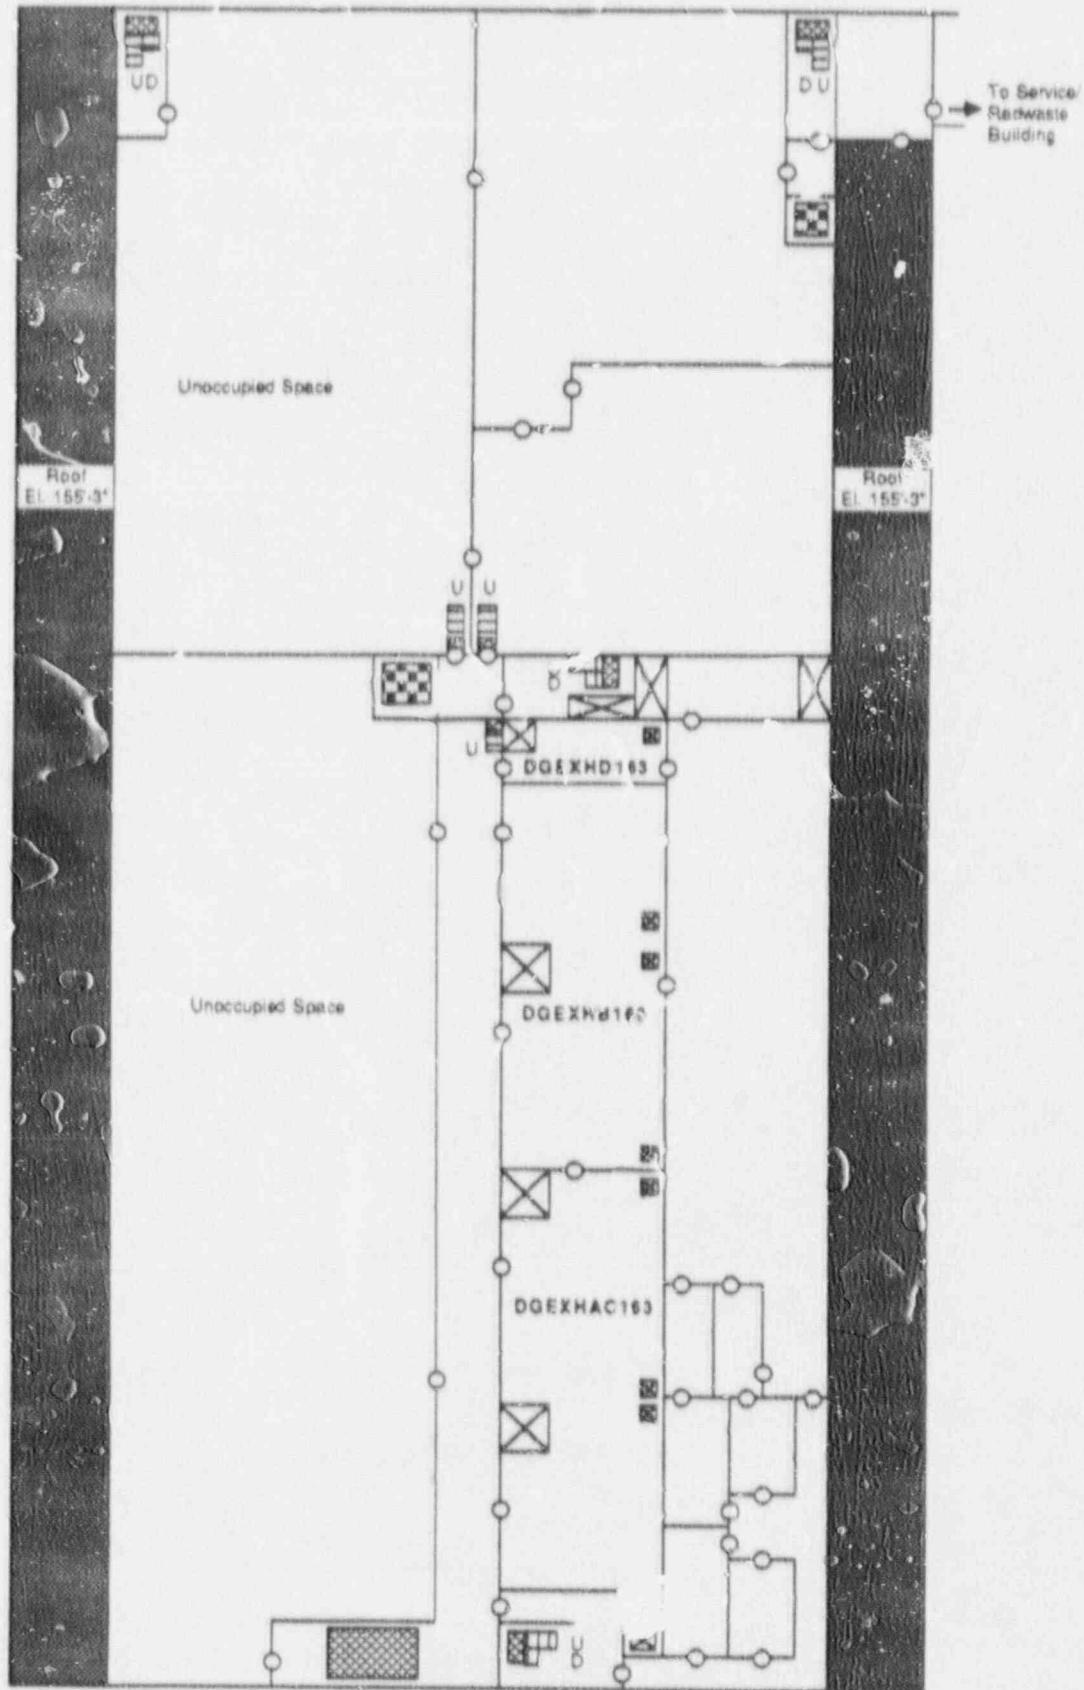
Hope Creek Control/Diesel Building Elevation 155'-3" and 163'-6"
